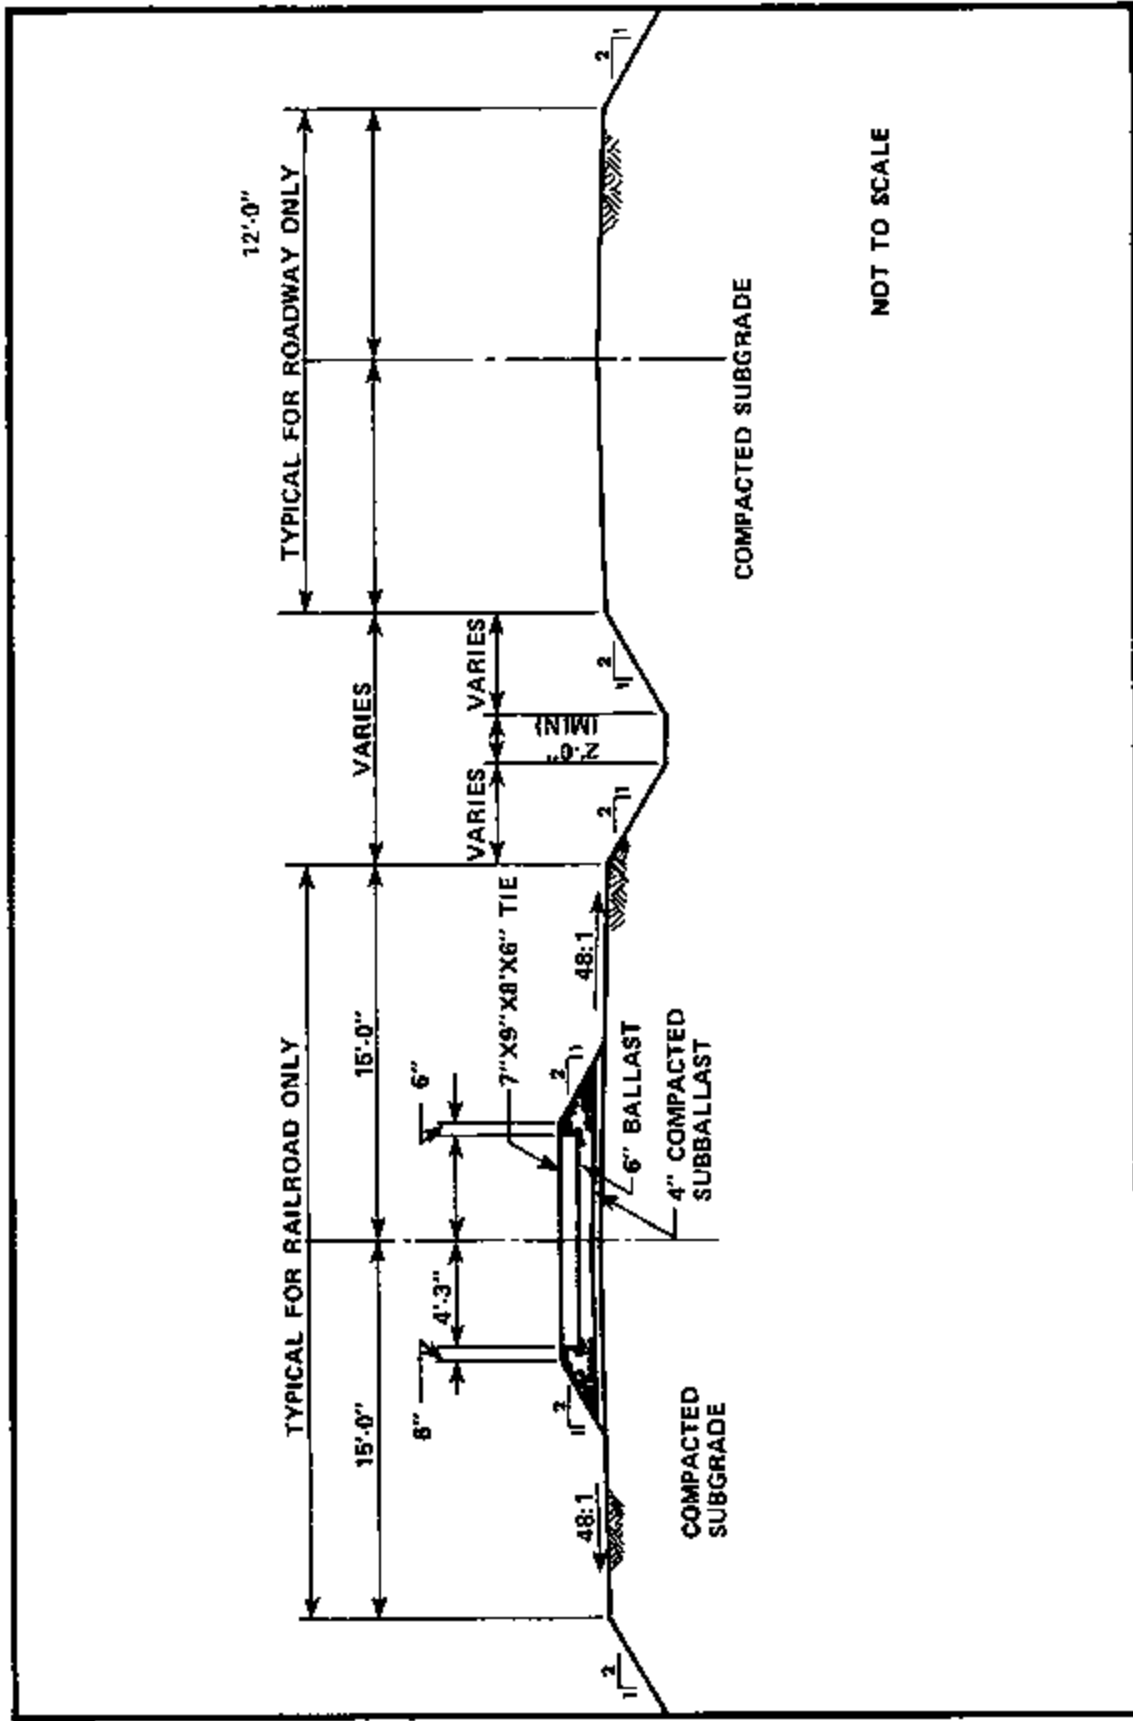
TYPICAL SECTION FOR SINGLE TRACK RAILROAD AND ROADWAY.
